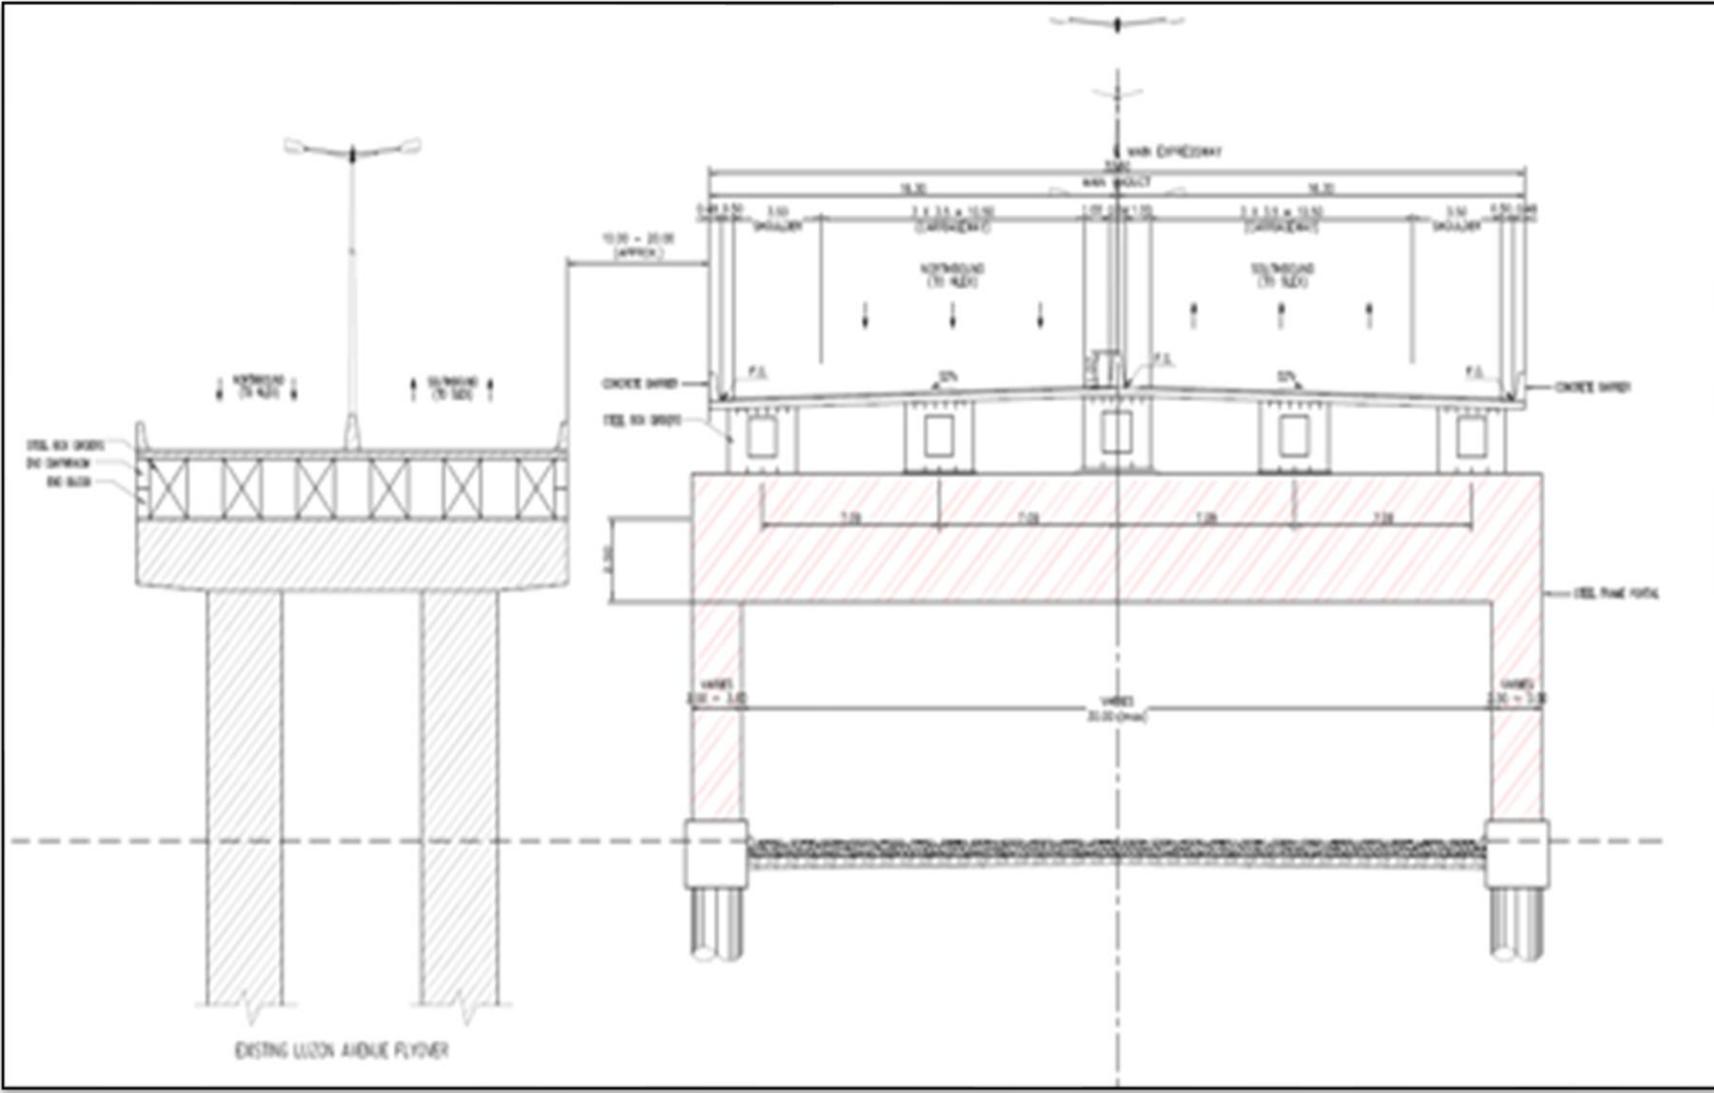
Proposed cross-section of structure crossing Commonwealth Ave.
